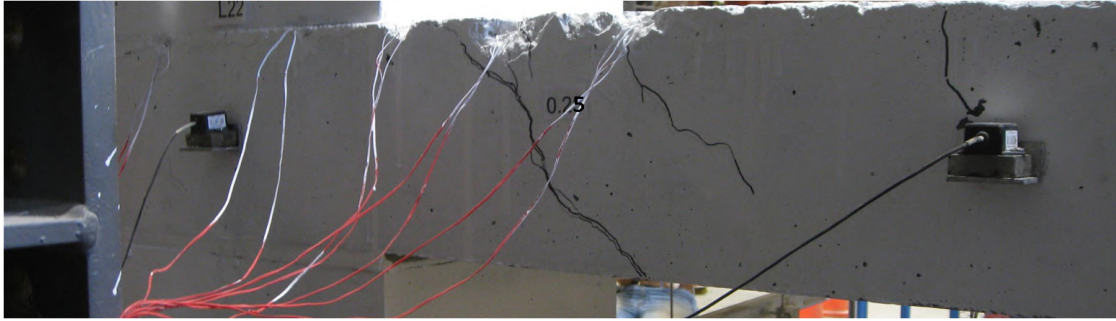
Specimen 3 free edge face cracks at $V = 234.9$ kN (west side)
